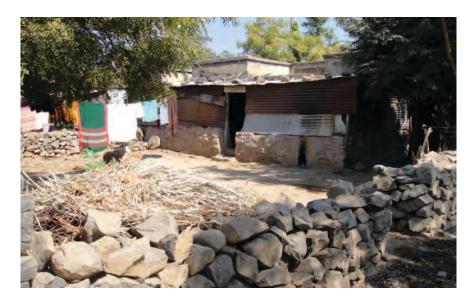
Stone in random rubble masonry is only used for making boundary walls.
